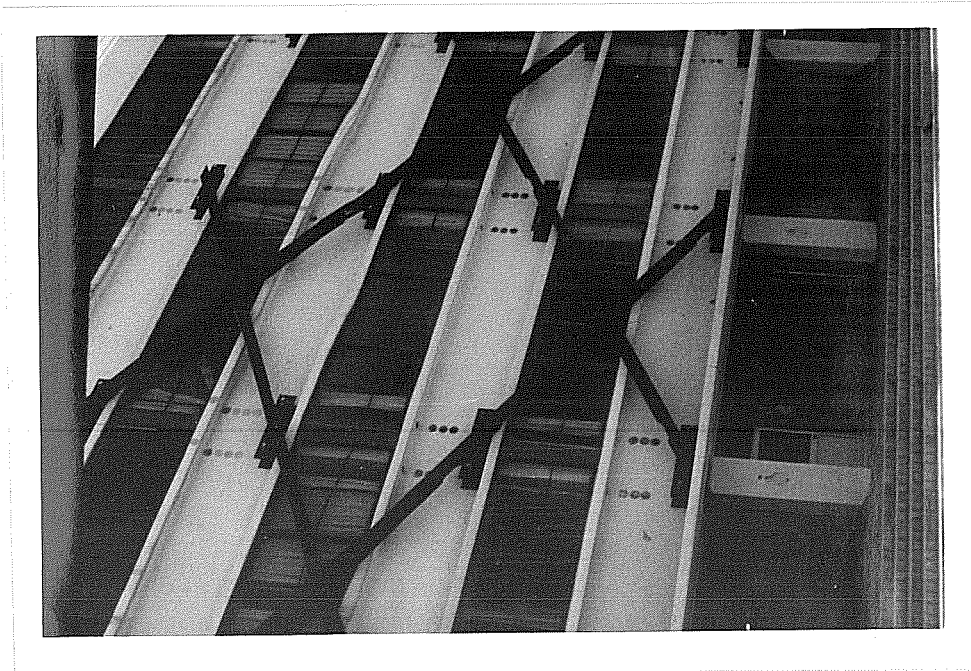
Sendai School, Japan; steel bracing retrofitting
